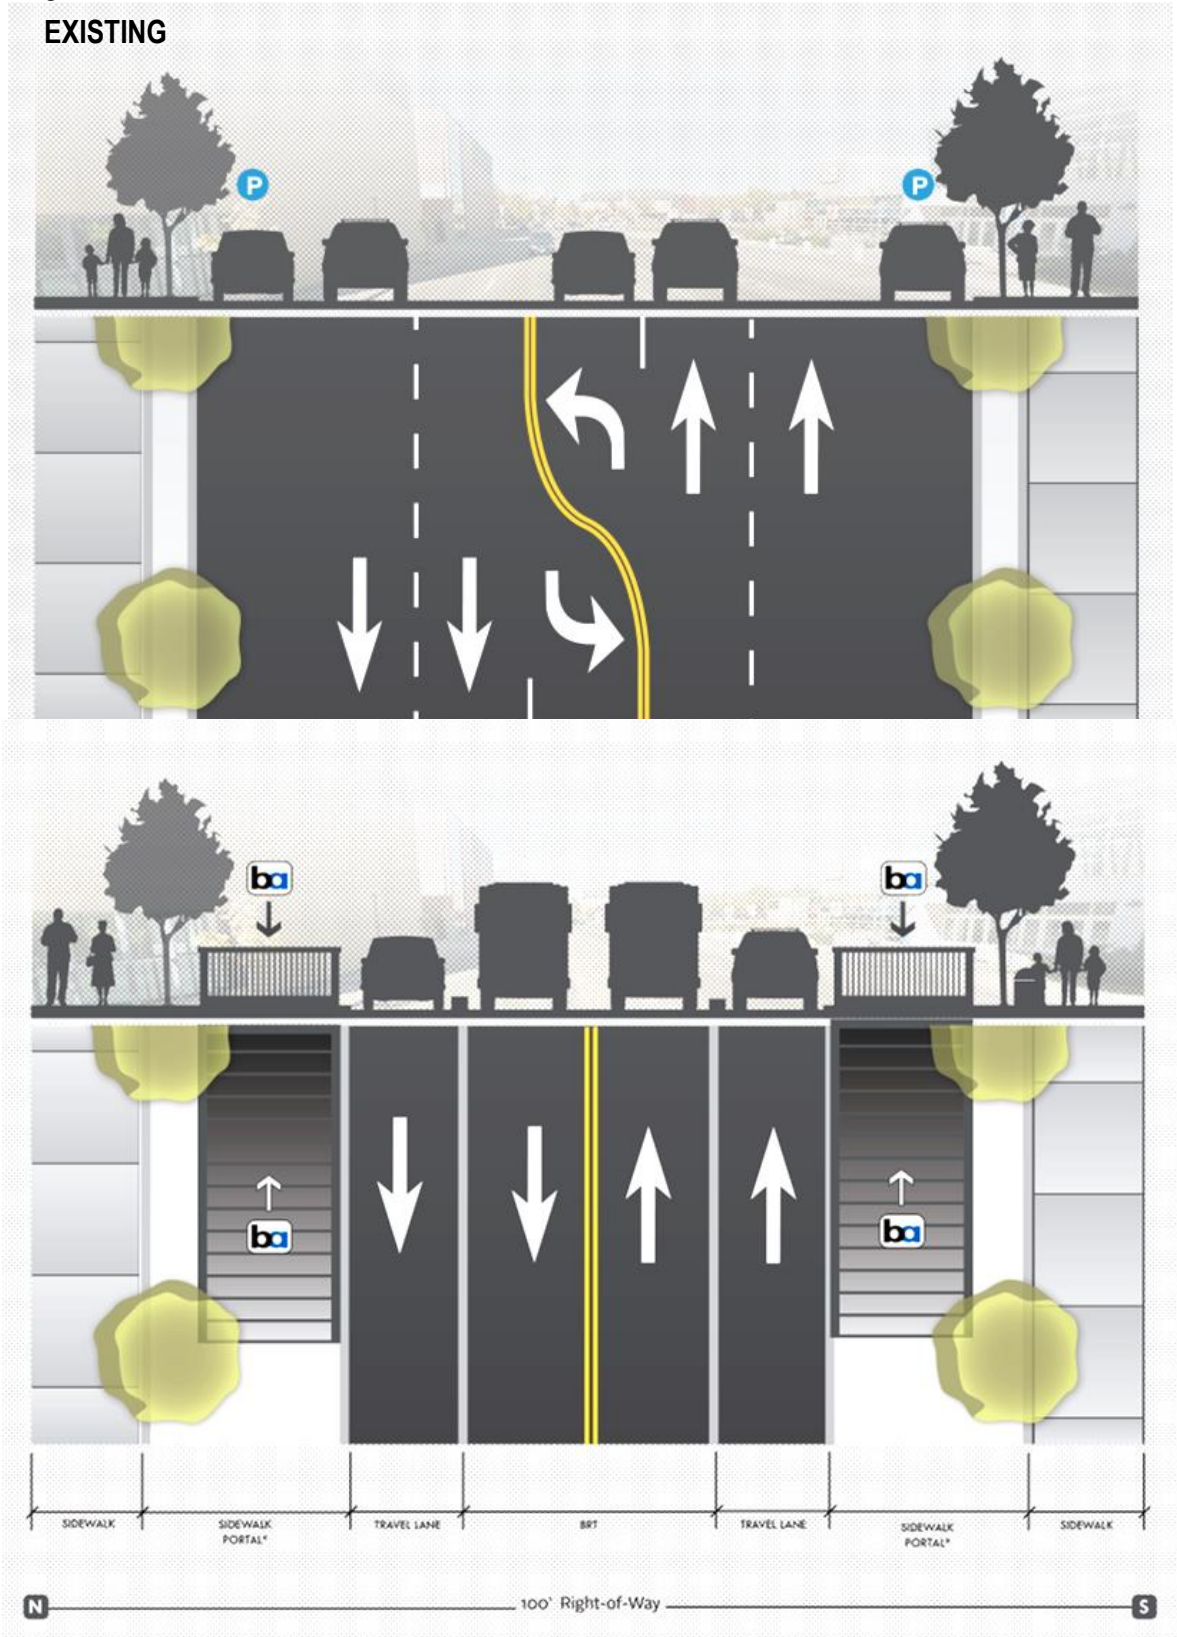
Potential Cross Section for Santa Clara Street between 2<sup>nd</sup> and 3<sup>rd</sup> Streets
